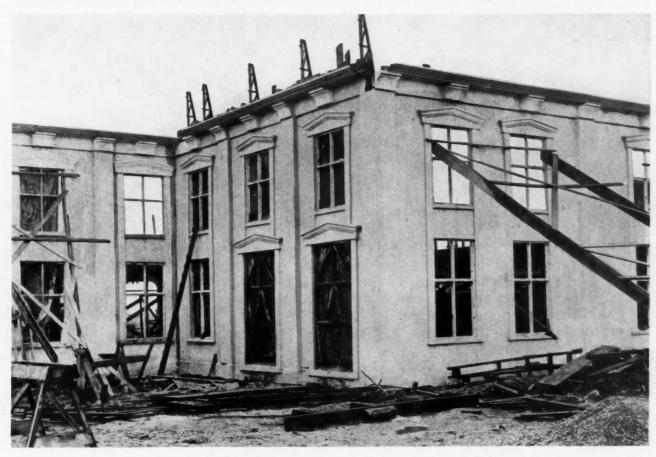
The Finished Walls Raised and Corners Locked-A Strong and Beautiful Structure
